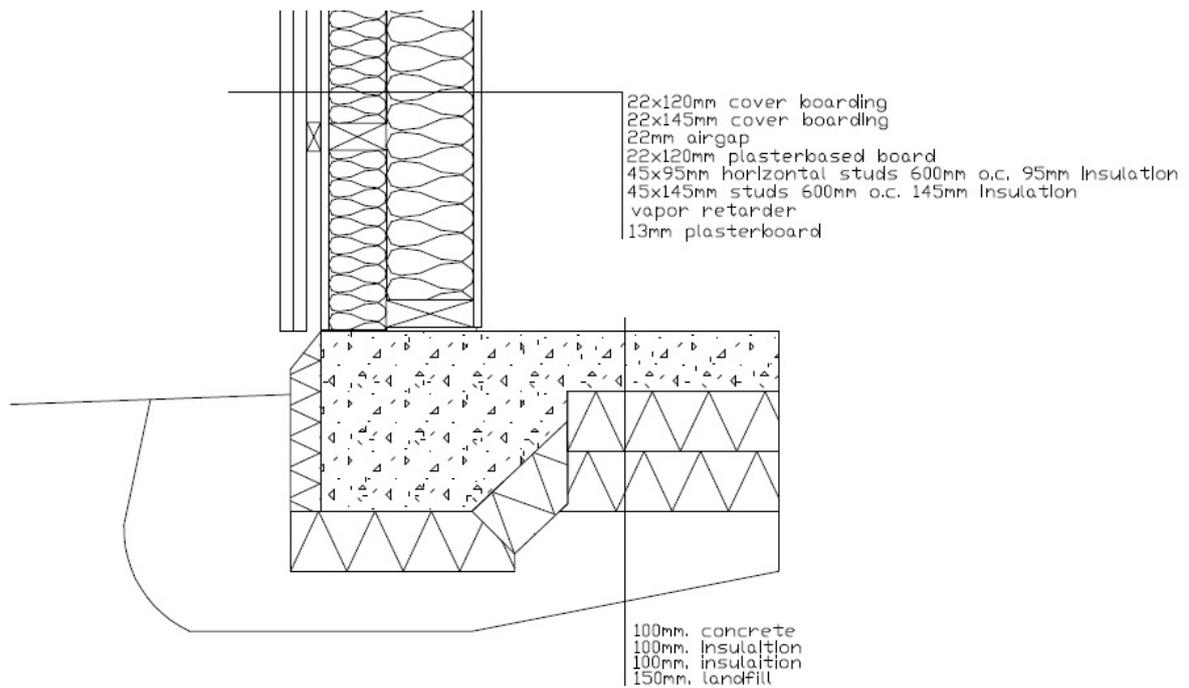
Swedish Type-house stud wall- and concrete slab constructions.
